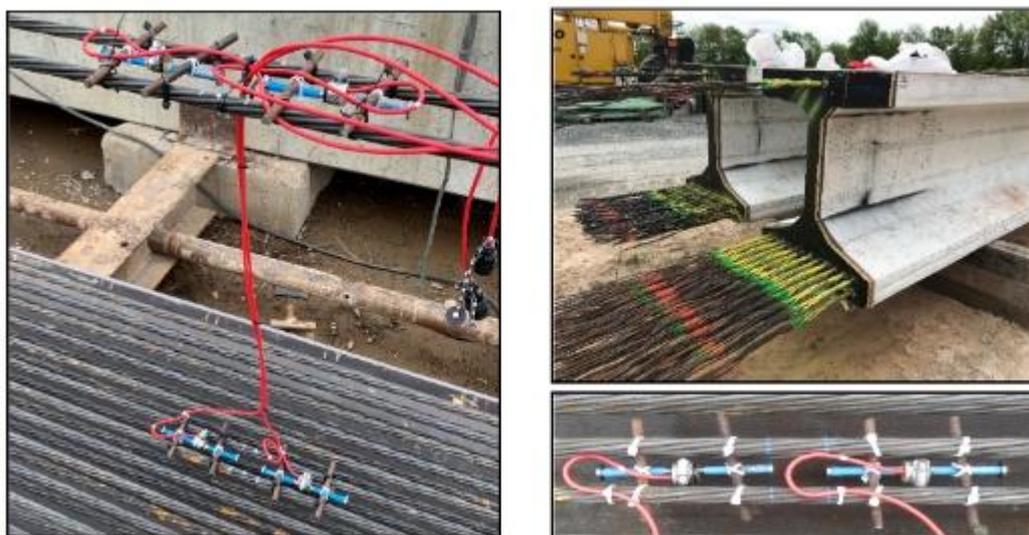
Girder construction and instrumentation at midspan. Source: FHW
